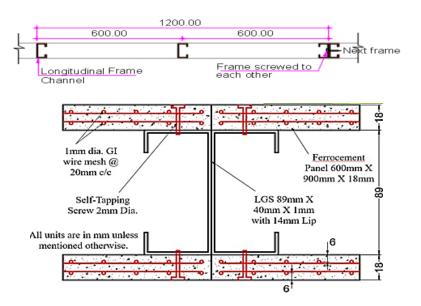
(f) – Section of typical Ferrocement-LGS frame
